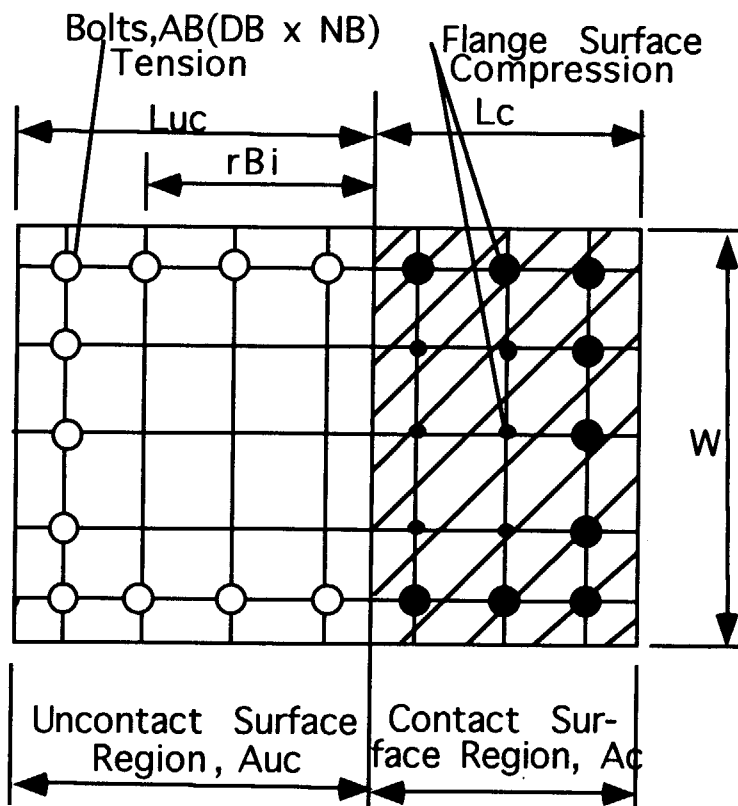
Schematic drawing of flange/bolts behaviors at the loading
